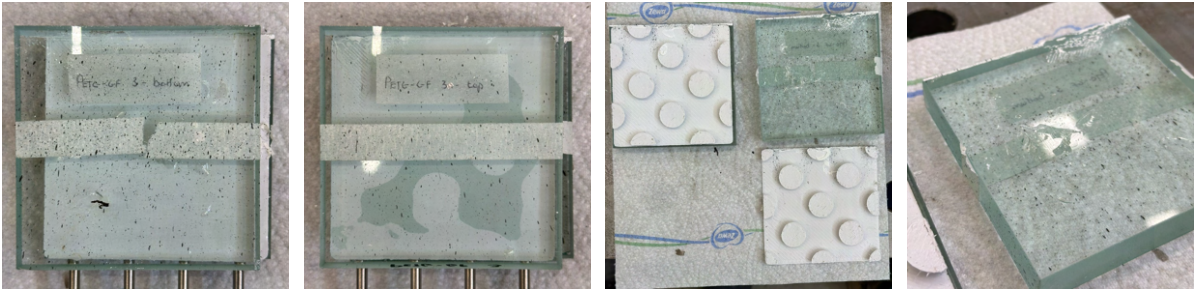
Specimen S11 — PETG-GF, Geometry 3 after testing
